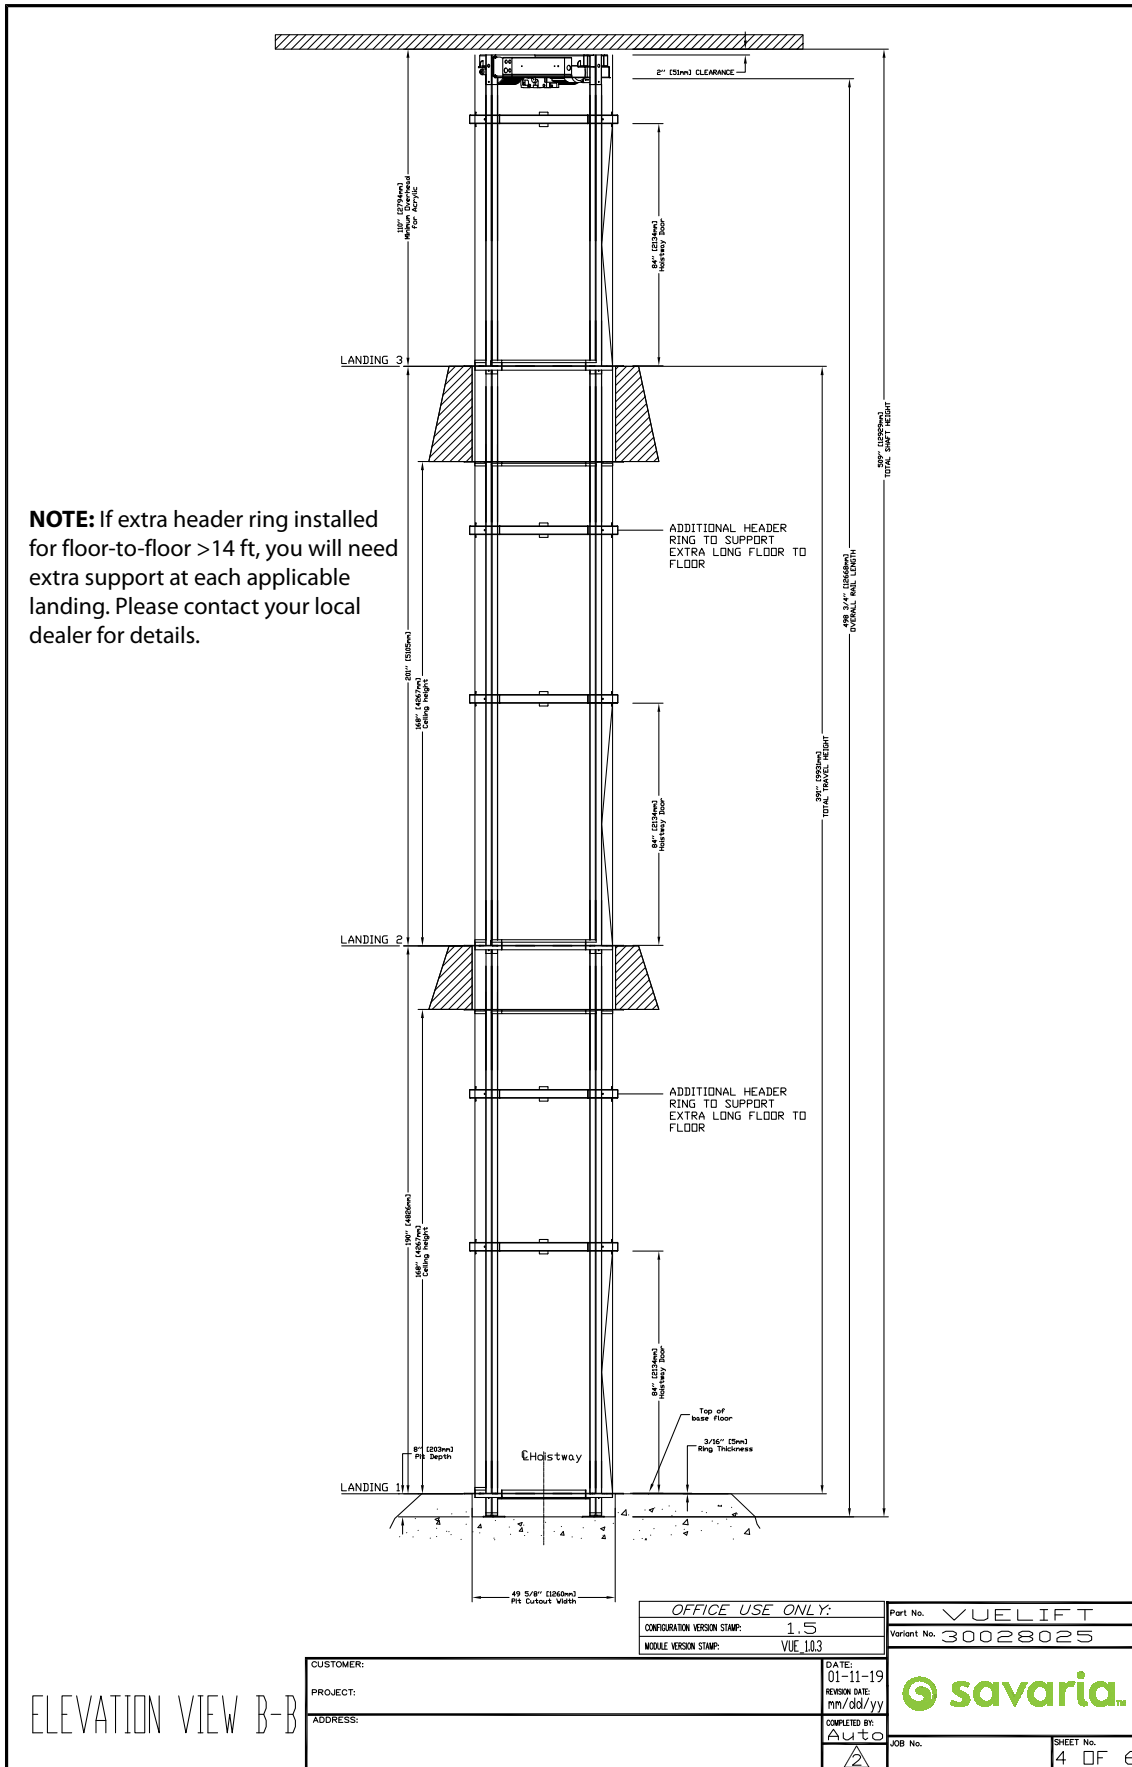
Elevation view octagonal glass (OGM) type 2 - extra header rings if floor-to-floor height > 14 ft
